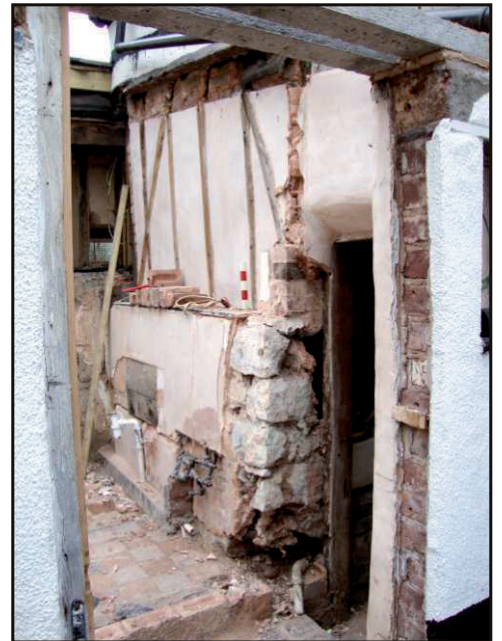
Outside wall of extension showing limestone yard wall and later framing, looking southwest. 0.25m scale.
